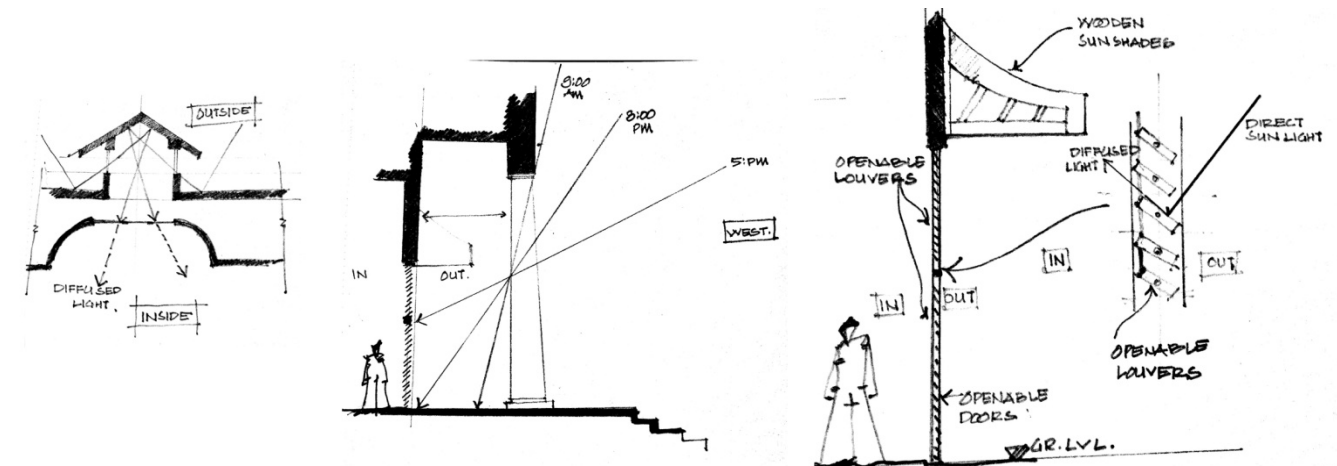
(a) The Lantern light located at the Central Grand Hall (Authors). (b) Sun angles at the west façade (c) Section showing the weather shade (Jhilmils) and louvers (Authors).
